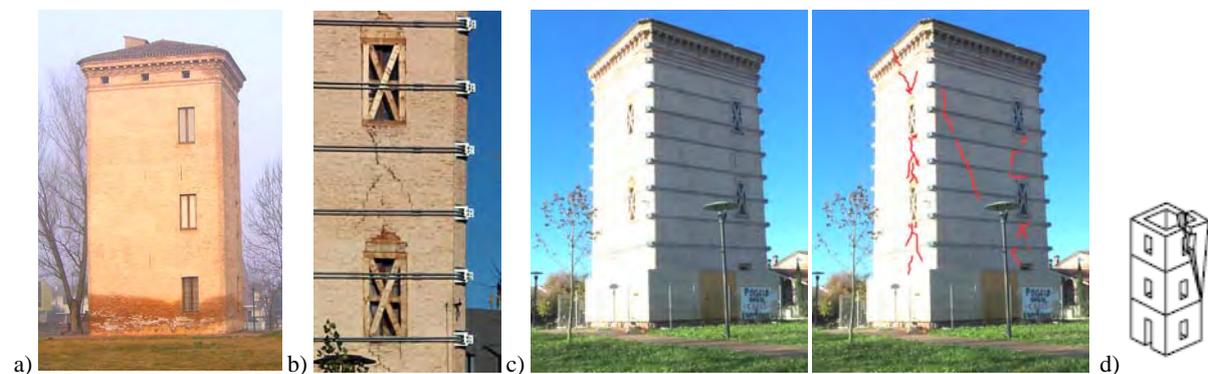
Torre Falconiera at Poggio Rusco before the earthquake (a); details of the shear cracks under the openings (b). The damaged platbands required a reinforcement of the openings with a wooden structure. The crack pattern (c) shows a shear behaviour of the walls that triggers a corner movement (d).
